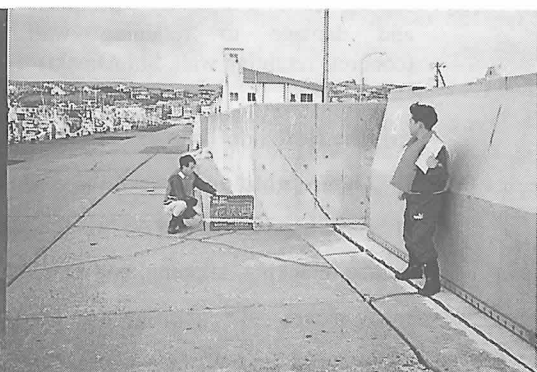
Cracking at the concrete base for the gates and shear cracks on the anti-tidal wave quaywall itself (Fishing port, Hanasaki in Nemuro city)
